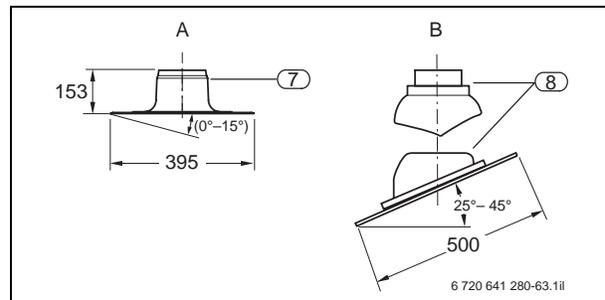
Universal roof tile and adhesive flat roof flange as additional equipment for the standard DO set (order separately; dim. in mm)
